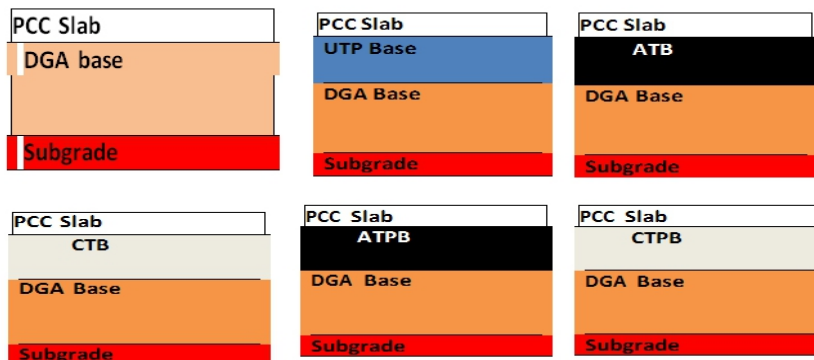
Pavement sections containing treated and untreated Permeable bases
